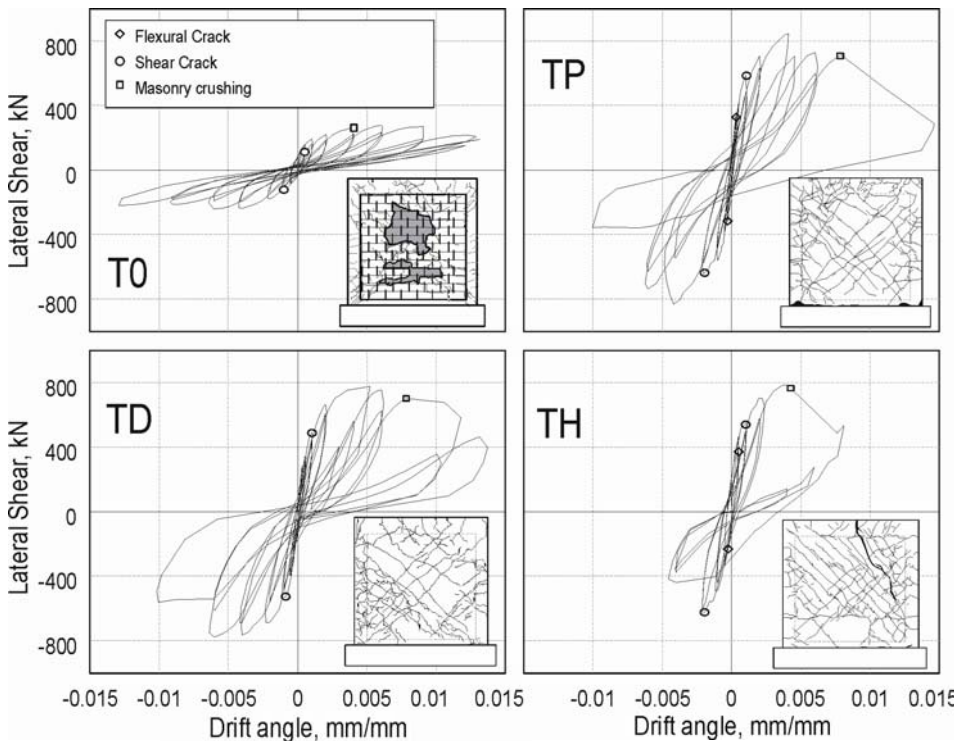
Final crack patterns and hysteretic curves of jacketed concrete masonry infills
